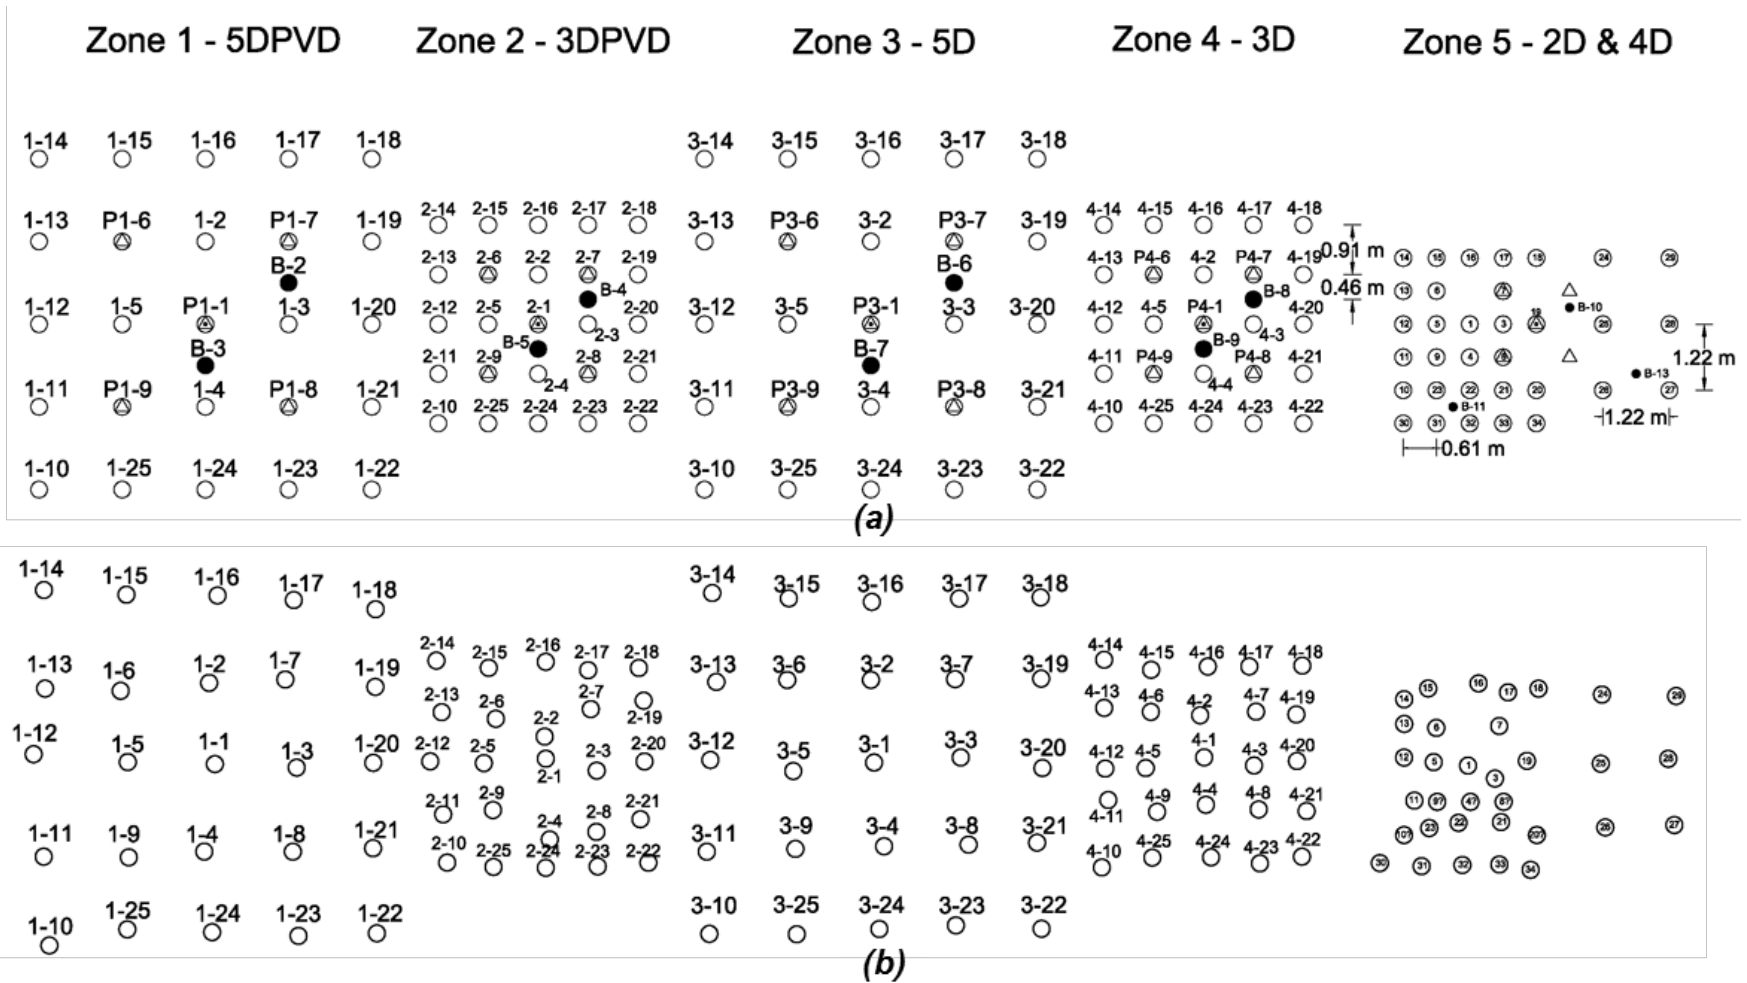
Layout of timber pile test program indicating (a) planned location of drained (PVD) and conventional piles (compare to Figure 3.10), and (b) actual as-built location of drained and conventional piles (survey measurements at pile head). *Note:* Zone 5 was altered from a 7 x 7 pile group at 2D spacing to 2D and 4D spacing based on observed driving response and damage to piles at 2D spacing. Densification at 2D was so great as to prevent reliable installation of the piling.
